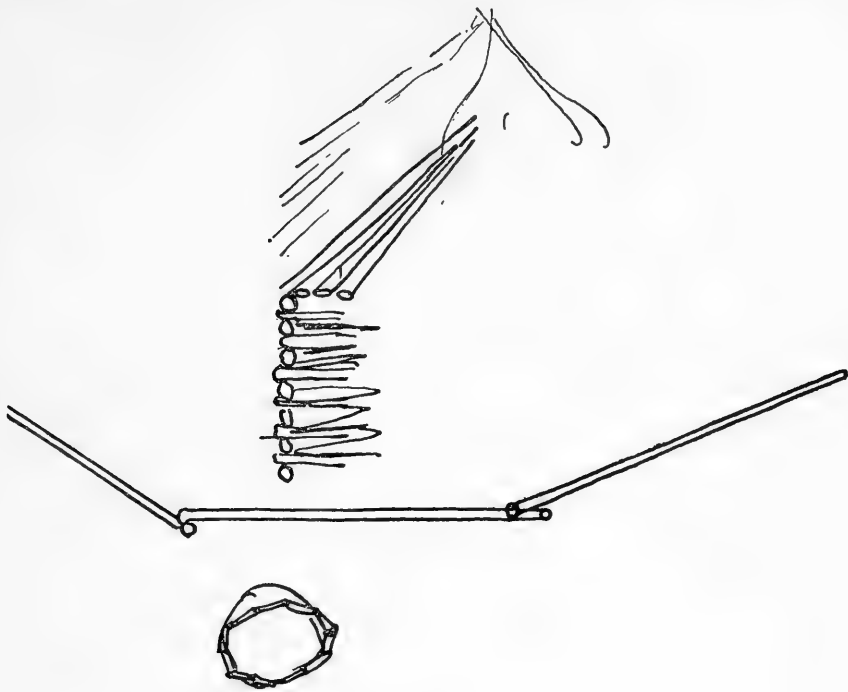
Sketches by Olbrechts illustrating the method used to construct a dance house. *Top*, profile of wall and roof; *center*, plan for laying of ground timbers; *bottom*, unidentified.
